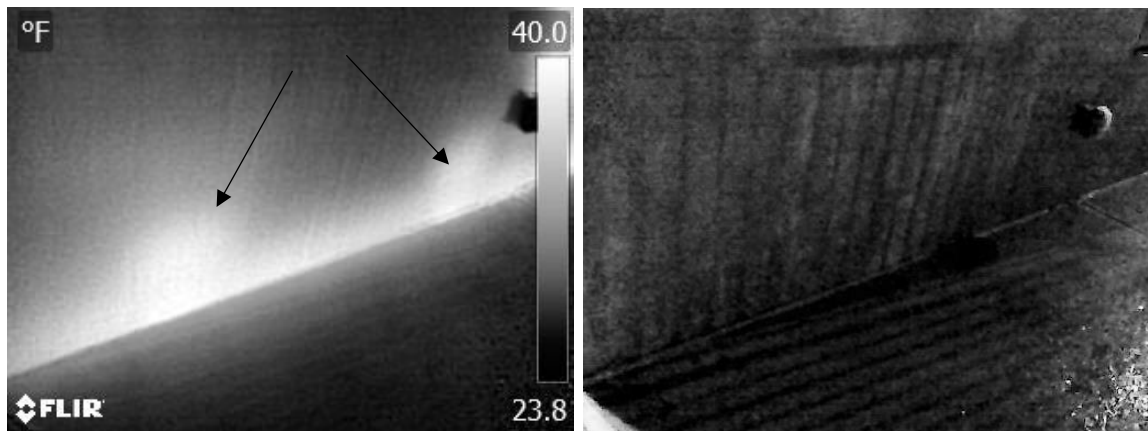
SWP structure with thermal bridging at foundation connections: thermal image (left) and visual image (right)
